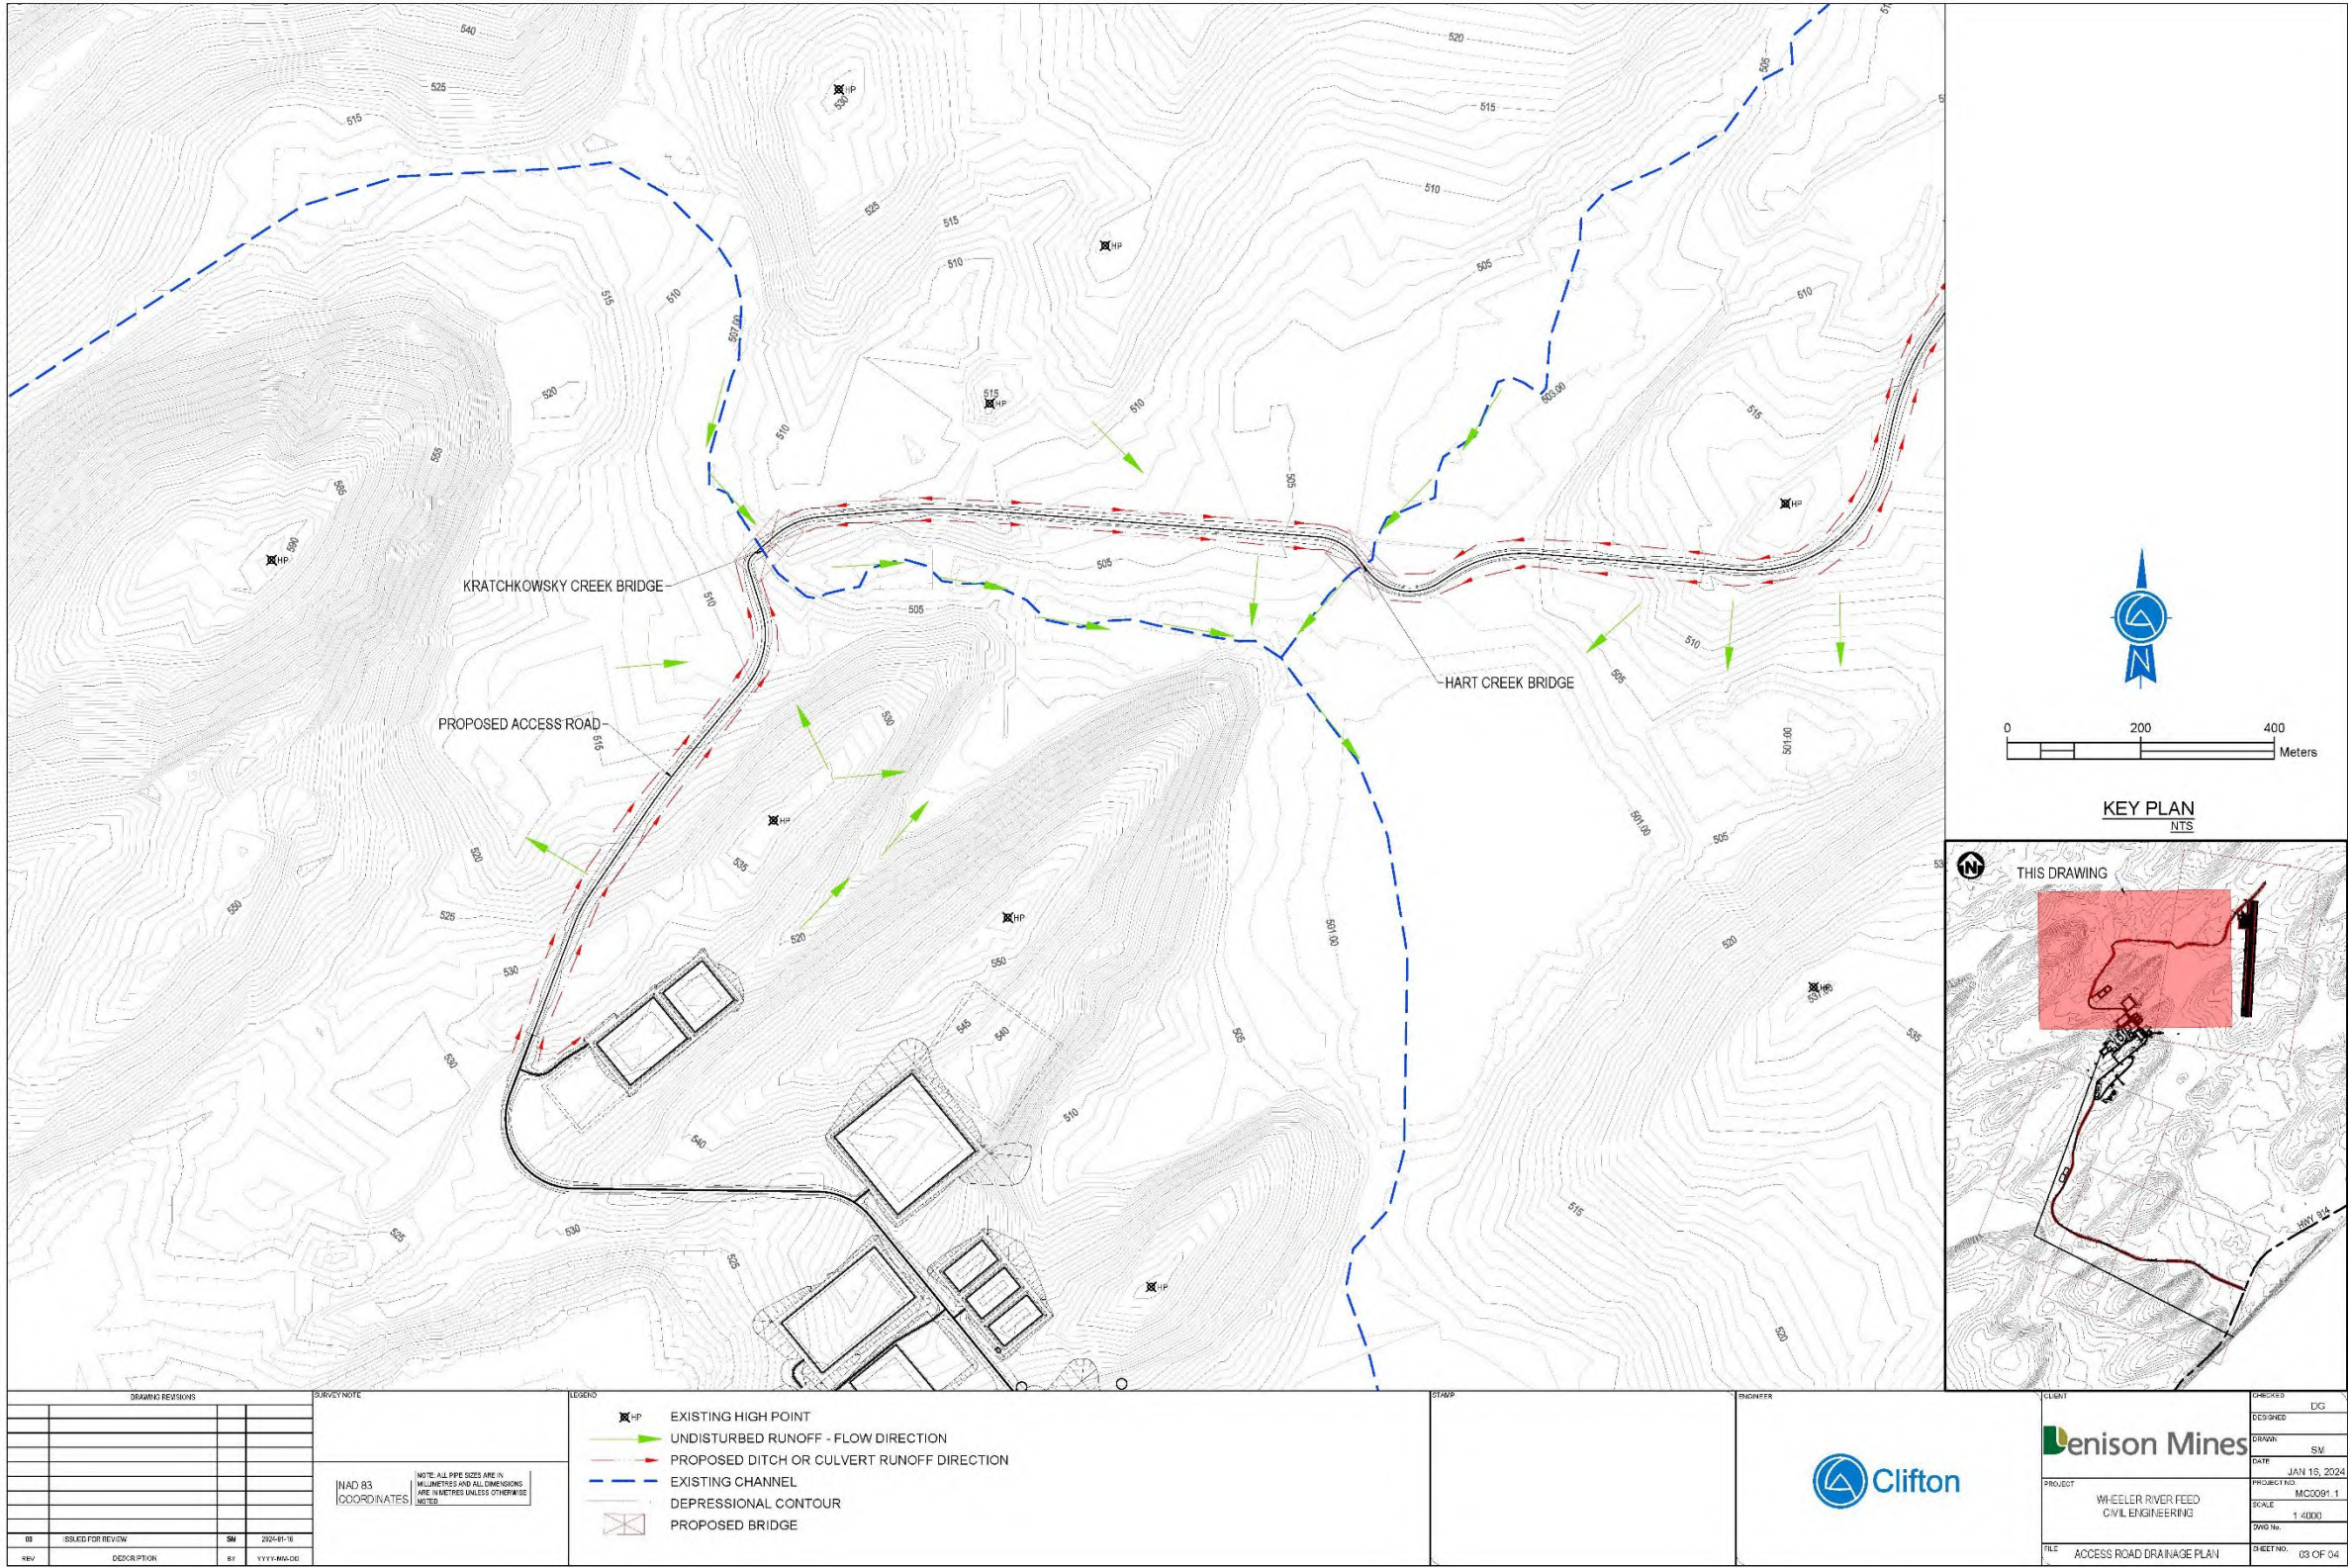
3: Conceptual Site Drainage – Road to Airstrip
